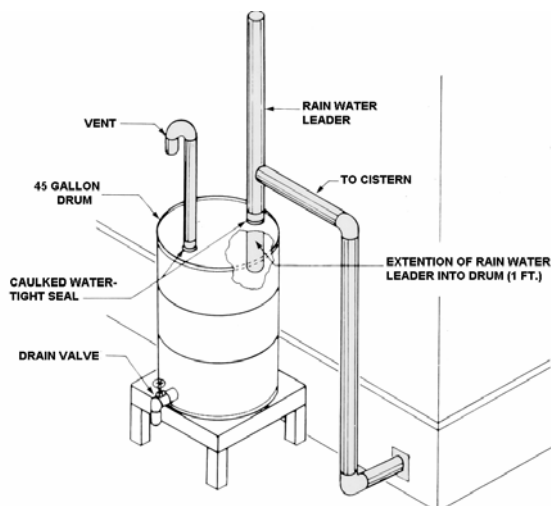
Run-off Water Sediment Barrel Located At Ground Level Outside Structure
